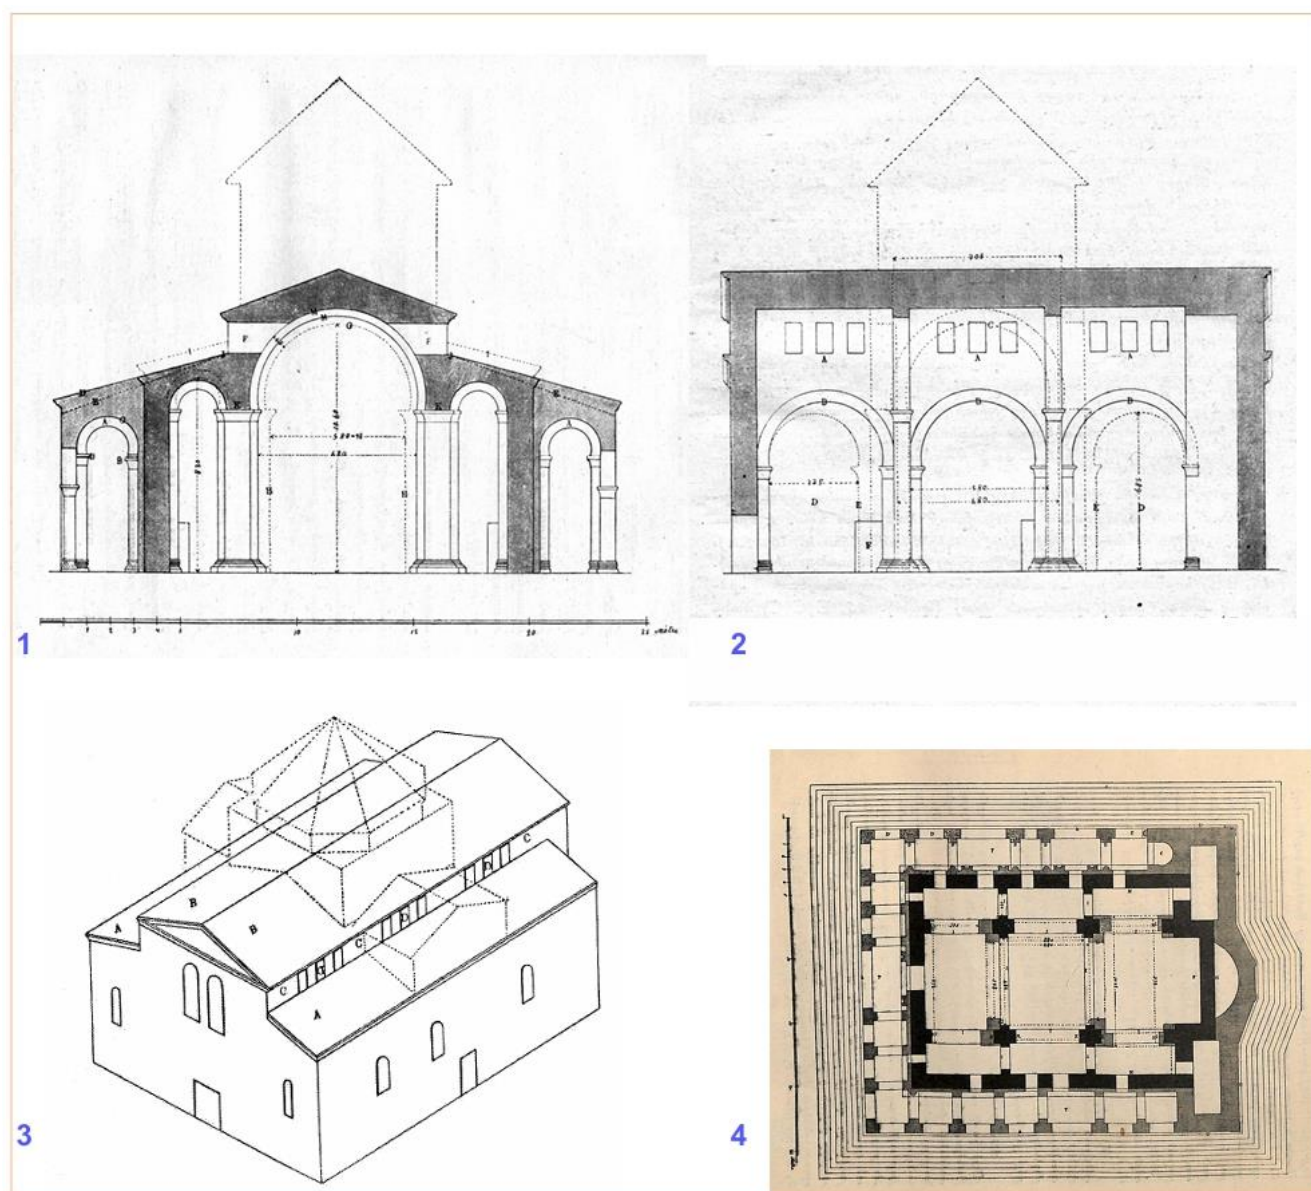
Theoretical reconstruction of the Tekor temple, according to Toramanyan: 1. cross-section; 2. longitudinal section; 3. axonometric view; 4. plan
